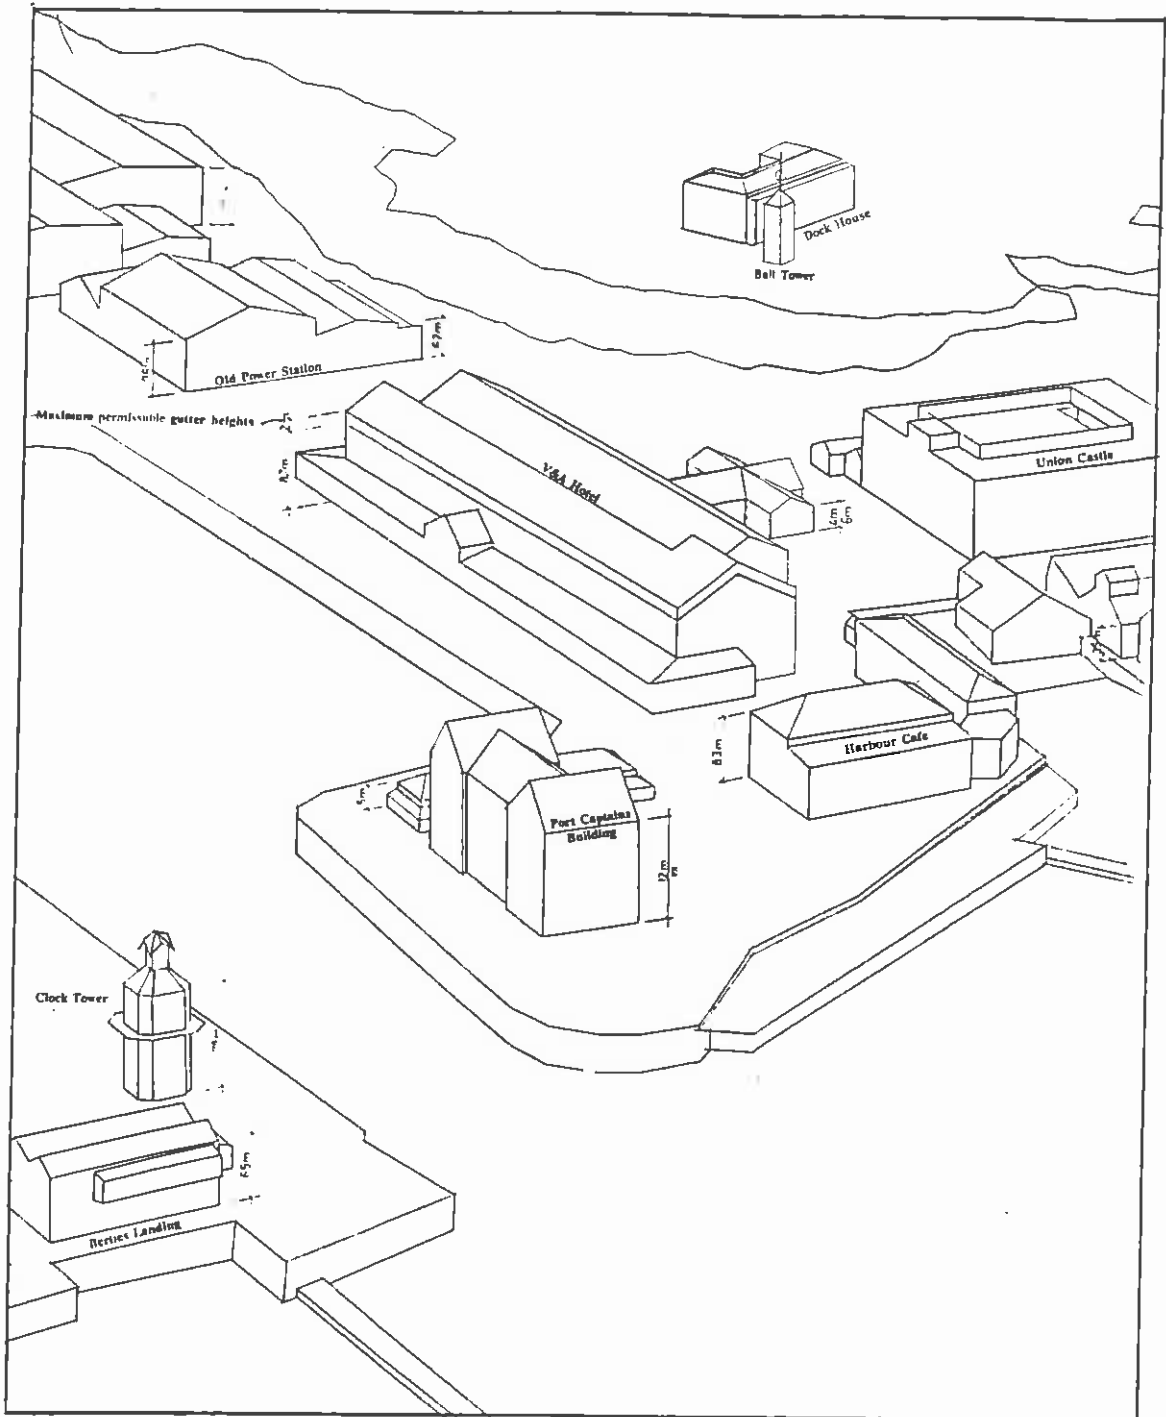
PIERHEAD SITE DEVELOPMENT PLAN
